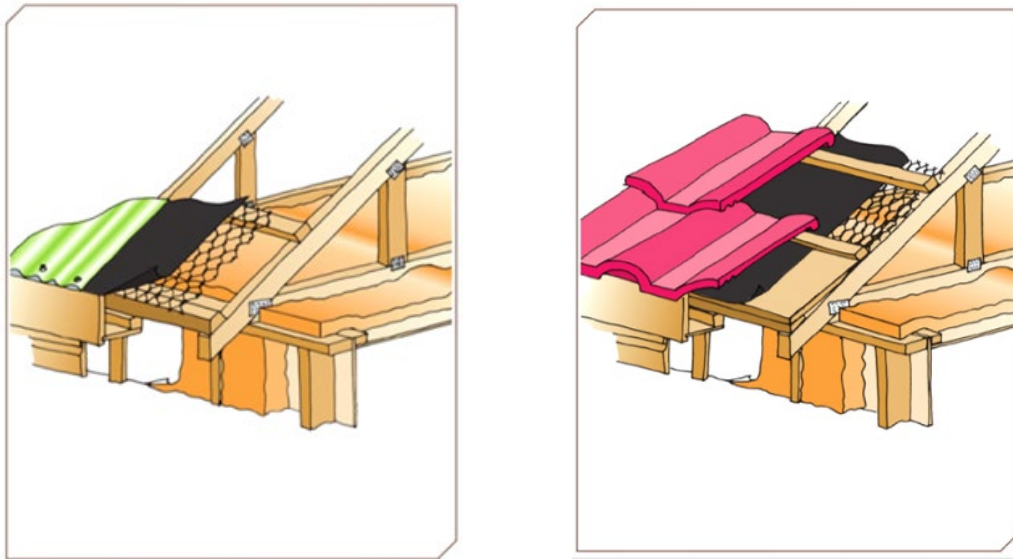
Truss roof assemblies with steel cladding or concrete tiles
